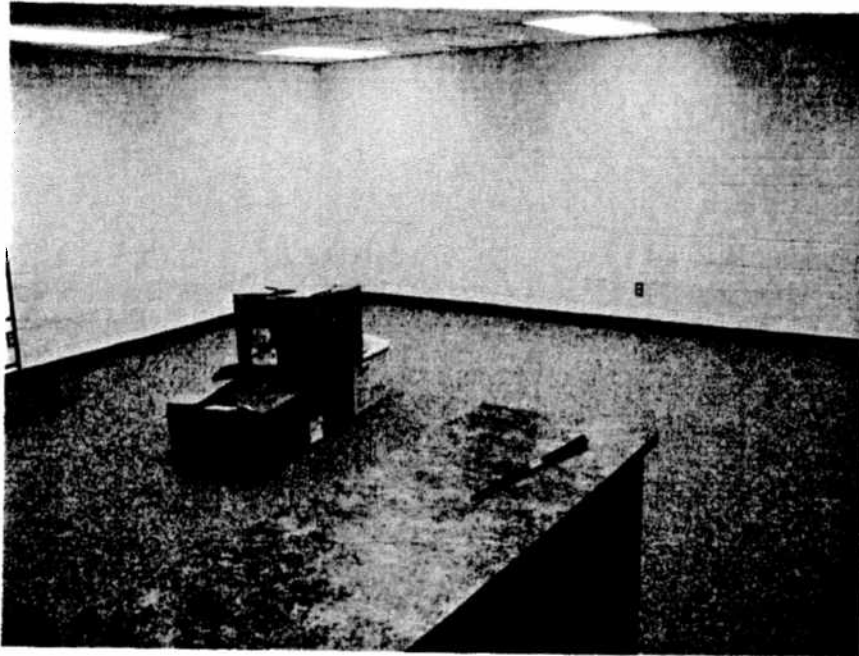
Office room on northeast side of building. Note new carpet, paint and ceiling panels.
